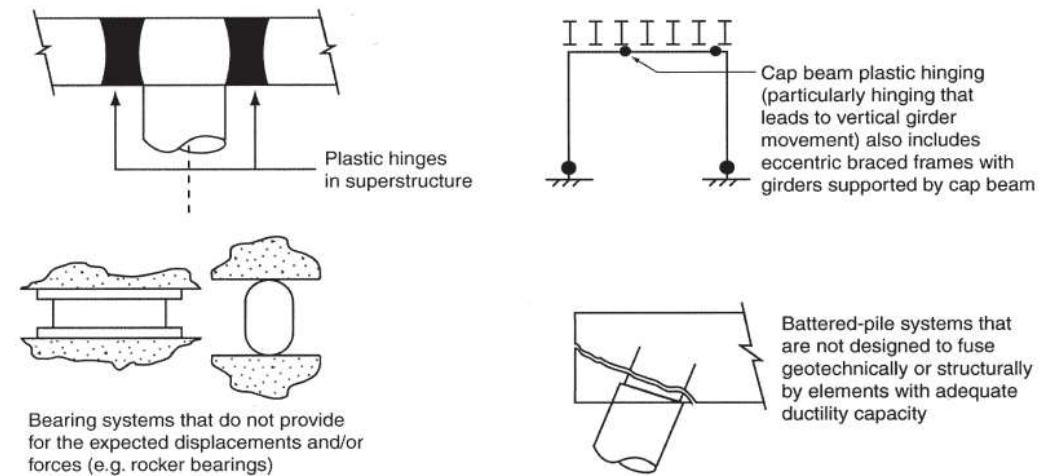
Earthquake-Resisting Elements that Are Not Recommended for New Bridges
